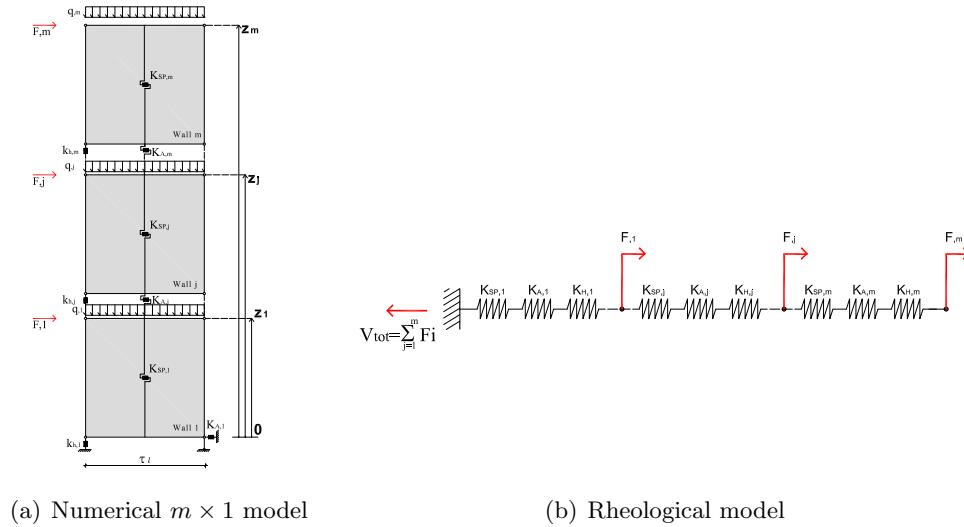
System of  $m \times 1$  walls modelling a single-shear wall of  $m$ -storey
